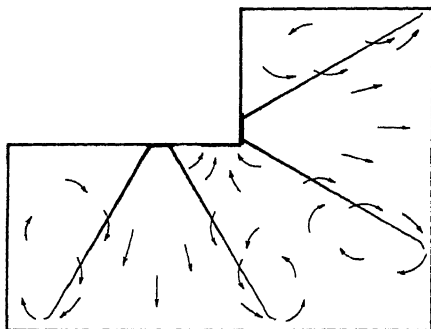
PLAN VIEW TYPICAL GENERAL OFFICE
